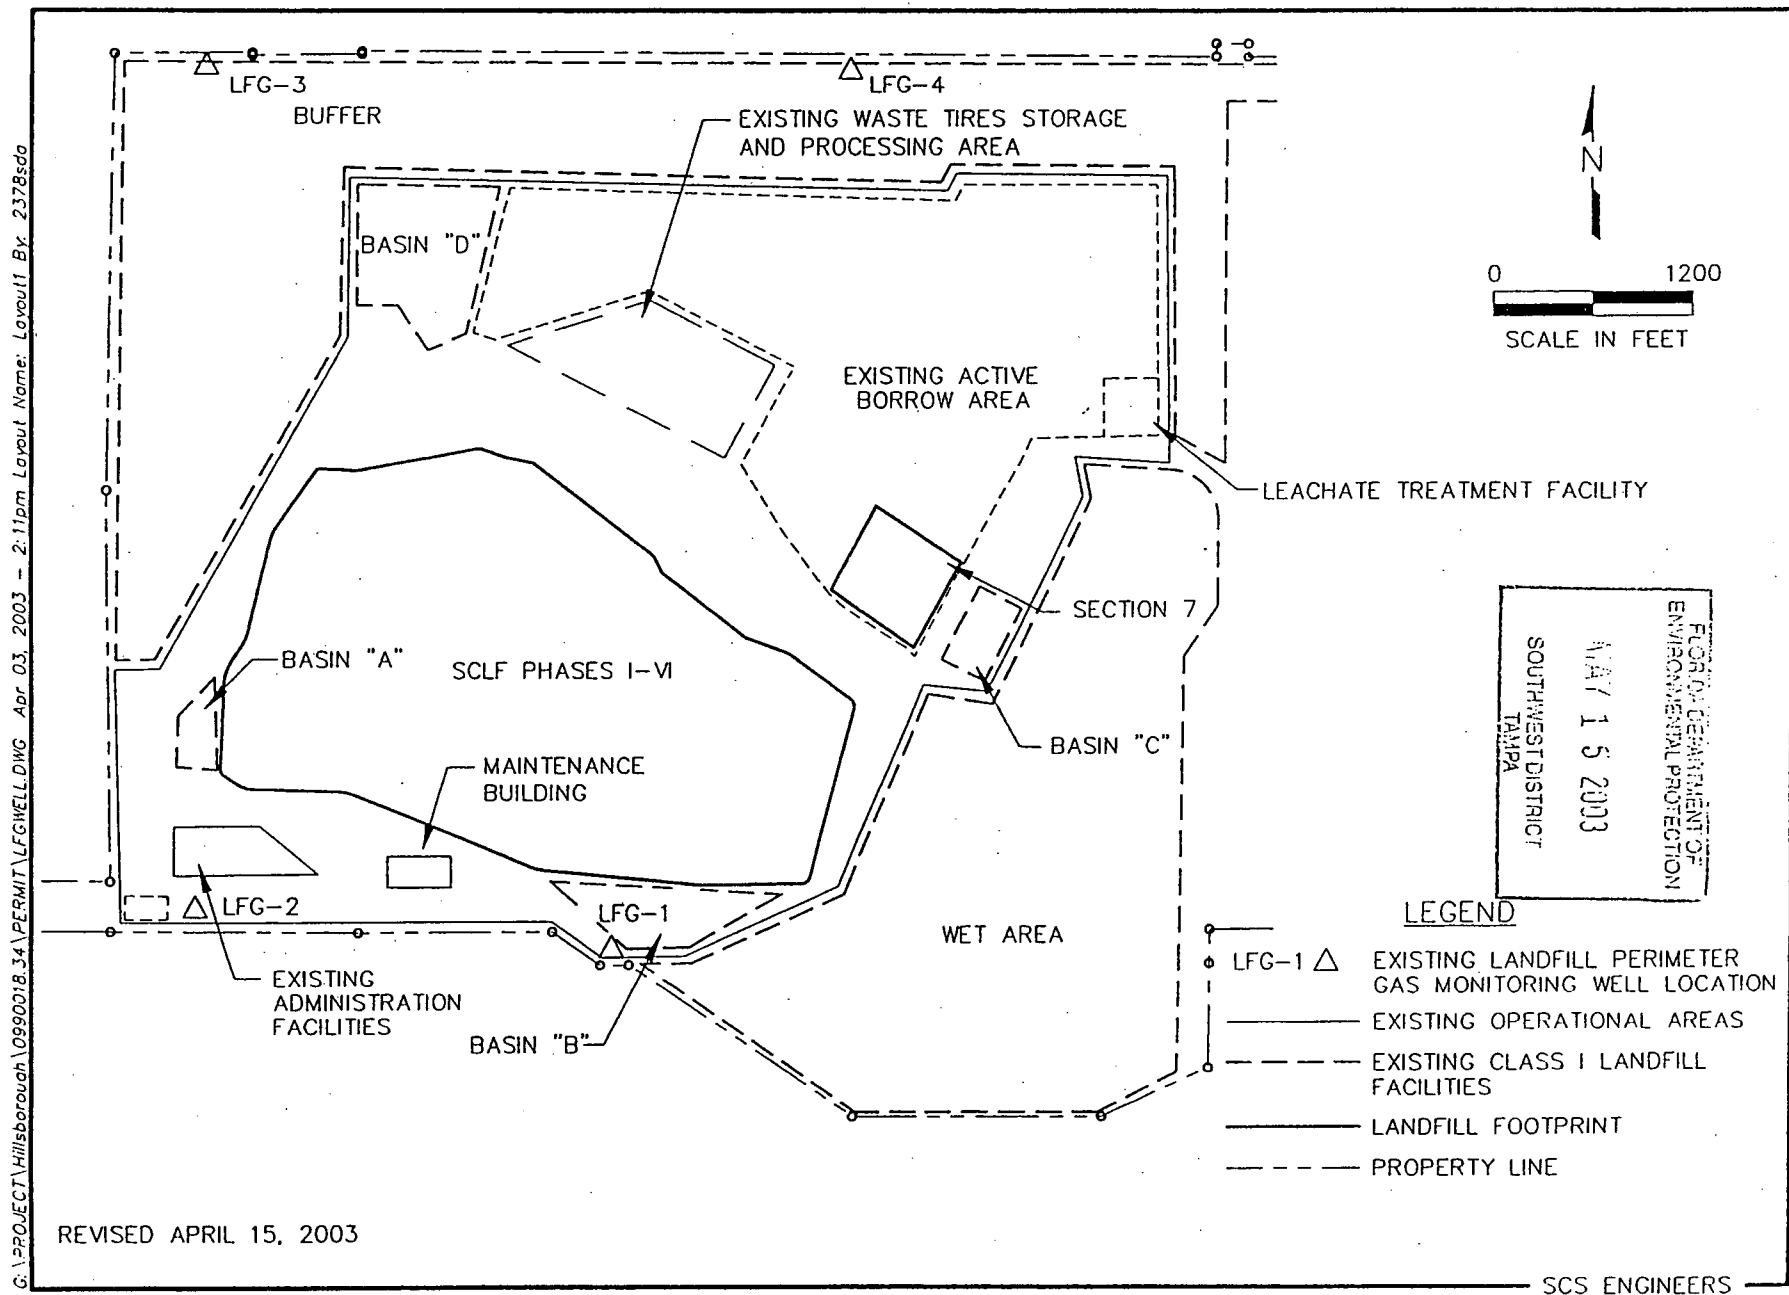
Landfill Gas Perimeter Monitoring Wells
